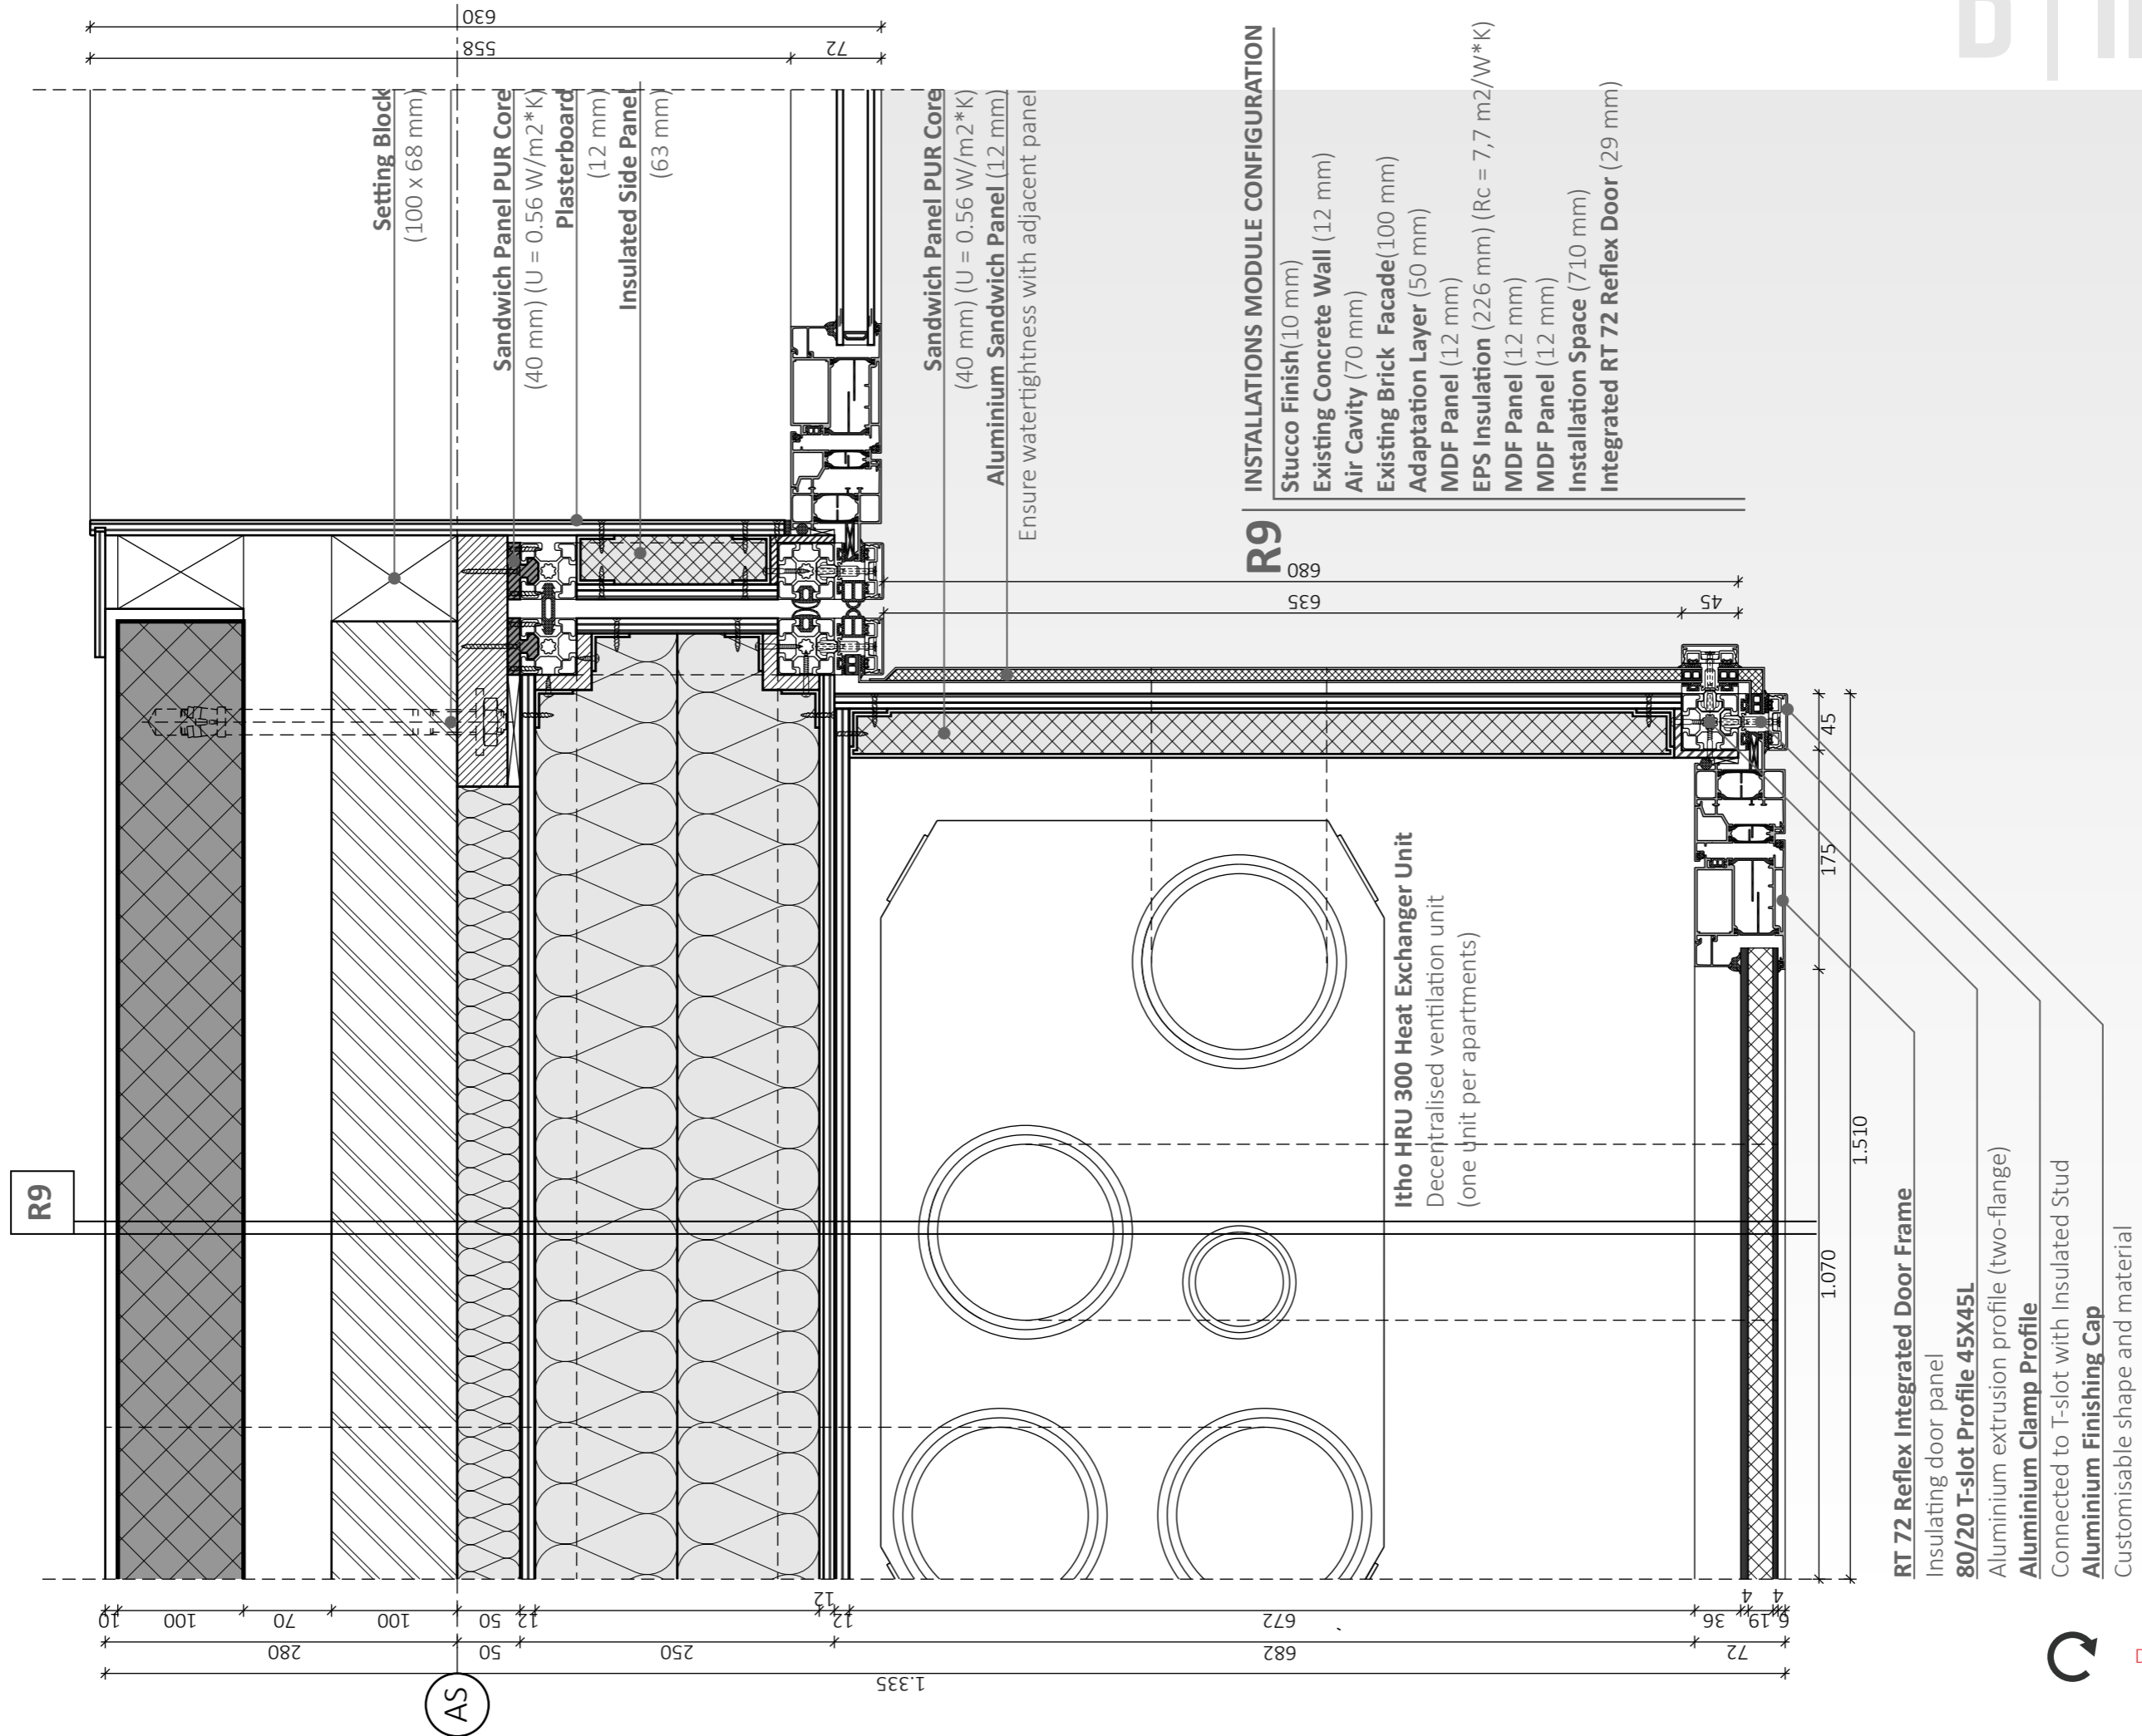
Detail | 1:5 | Horizontal | Installation Box
